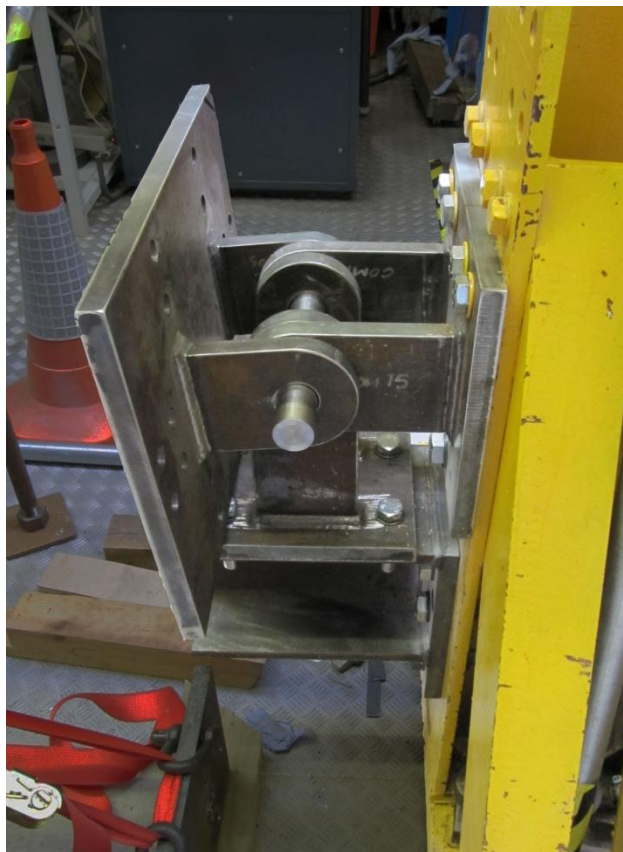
End detail connection with no load cells, shown without concrete specimen connected.
